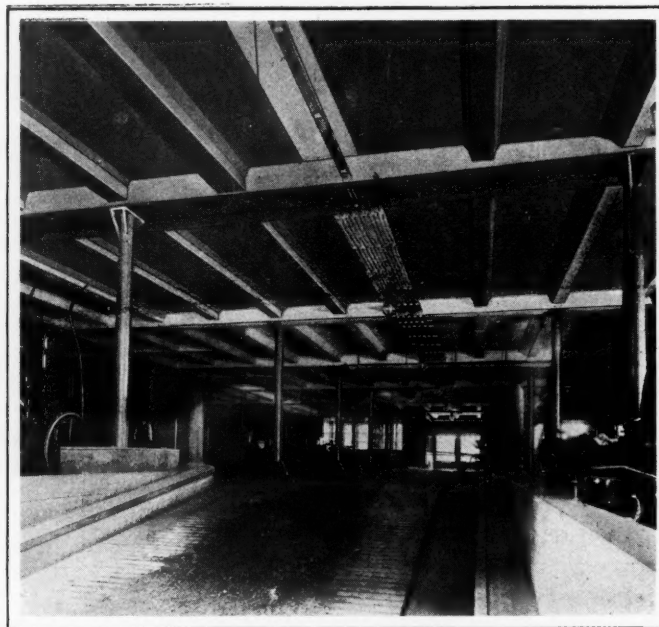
FIG. I.—SCHILLINGER CONCRETE BEAM CEILING IN STABLE
